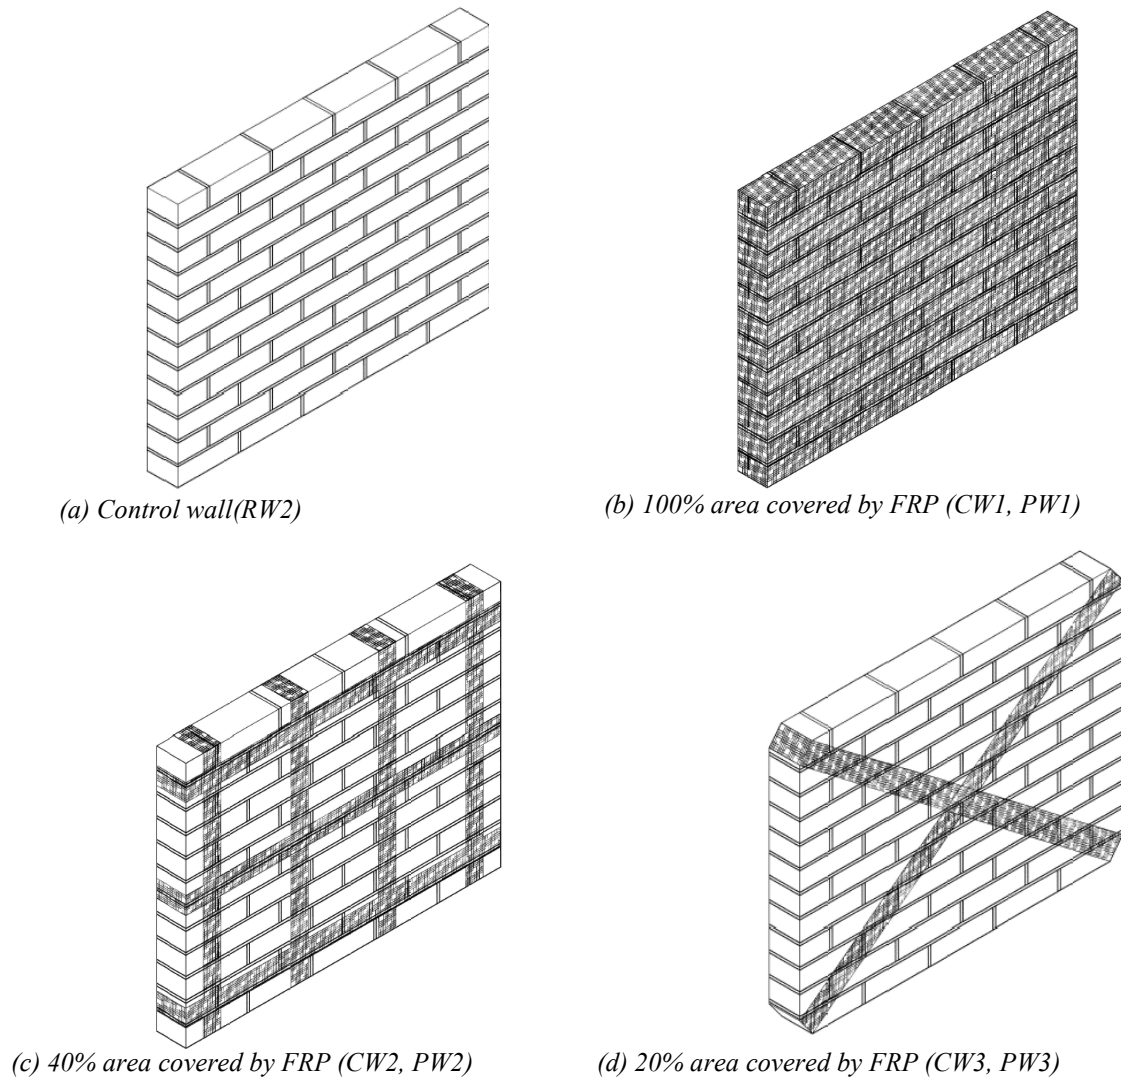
Wrapping technique of masonry wall by FRP waspecimen
